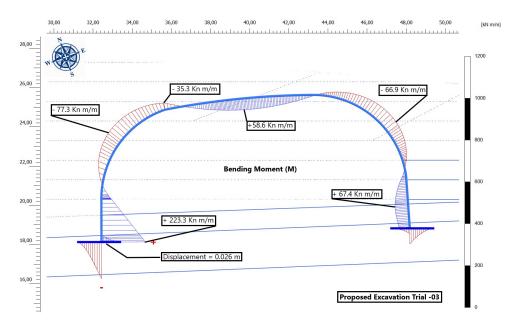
Bending moment - Proposed Excavation - Trial 03
